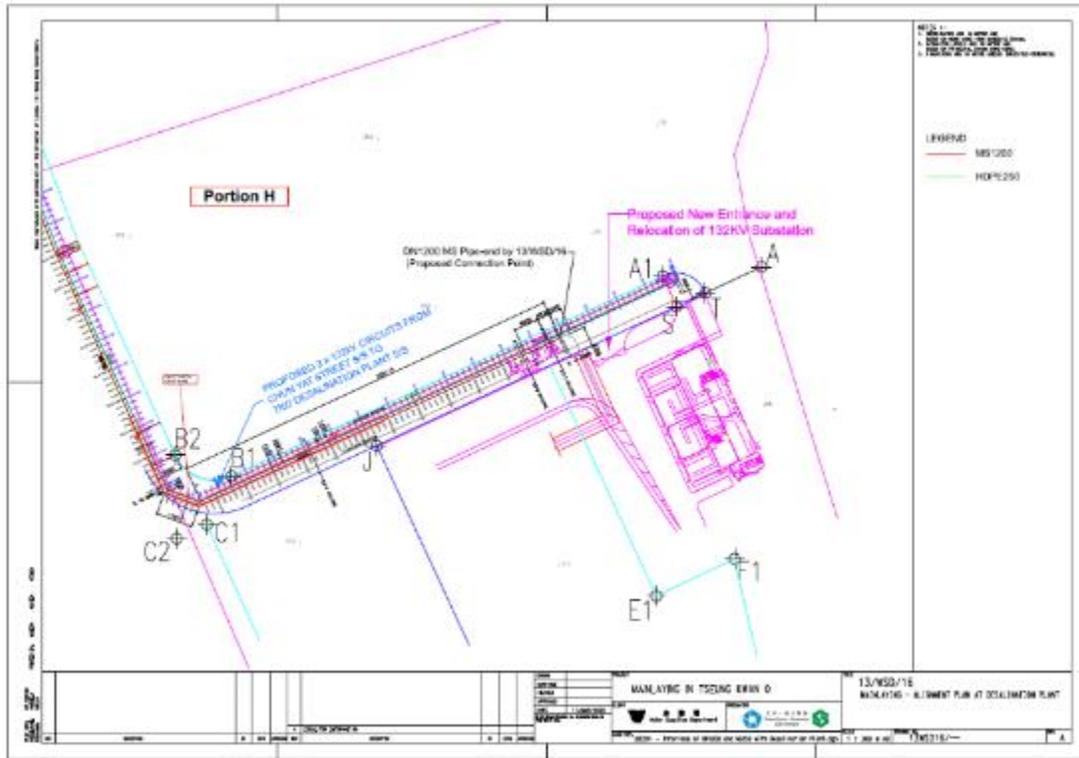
Location Plan for CH.CT 0+07 – 2+58
